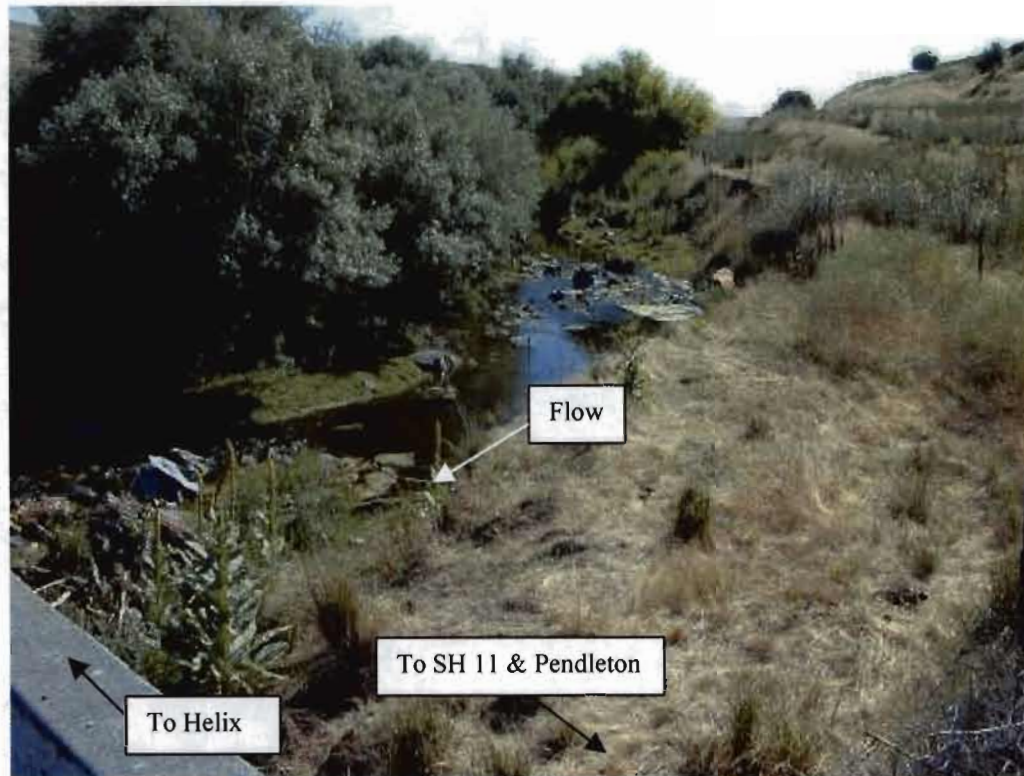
View looks upstream at Wildhorse Creek. Taken from east end of bridge.
